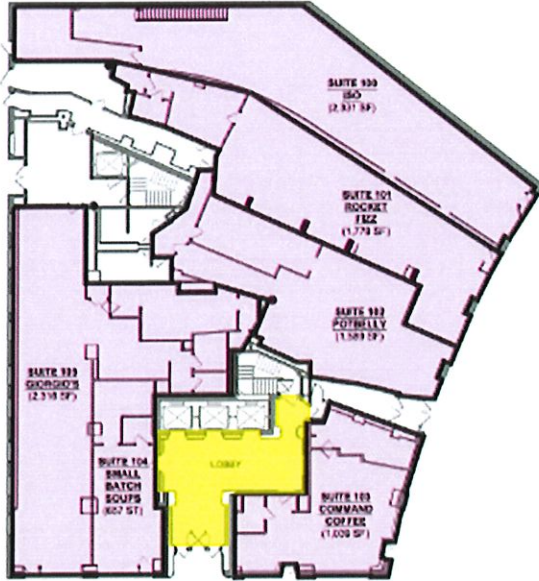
Floor Plan; Lobby Highlighted in Yellow
